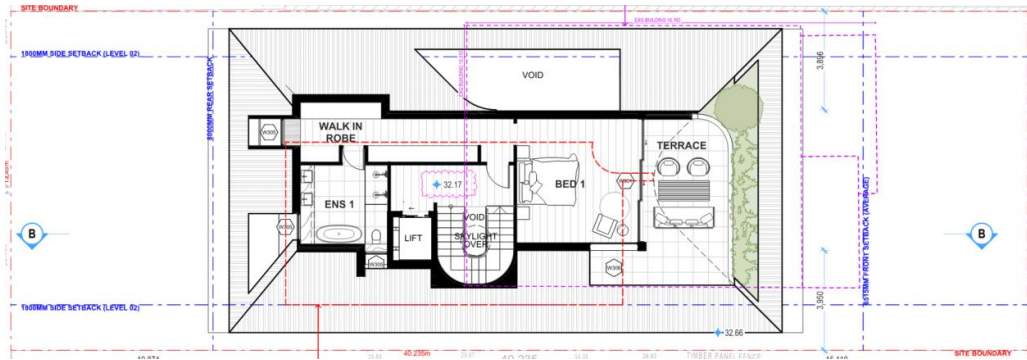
Proposed attic floor plan - 61 The Corso, Maroubra (Source: PopovBass)
